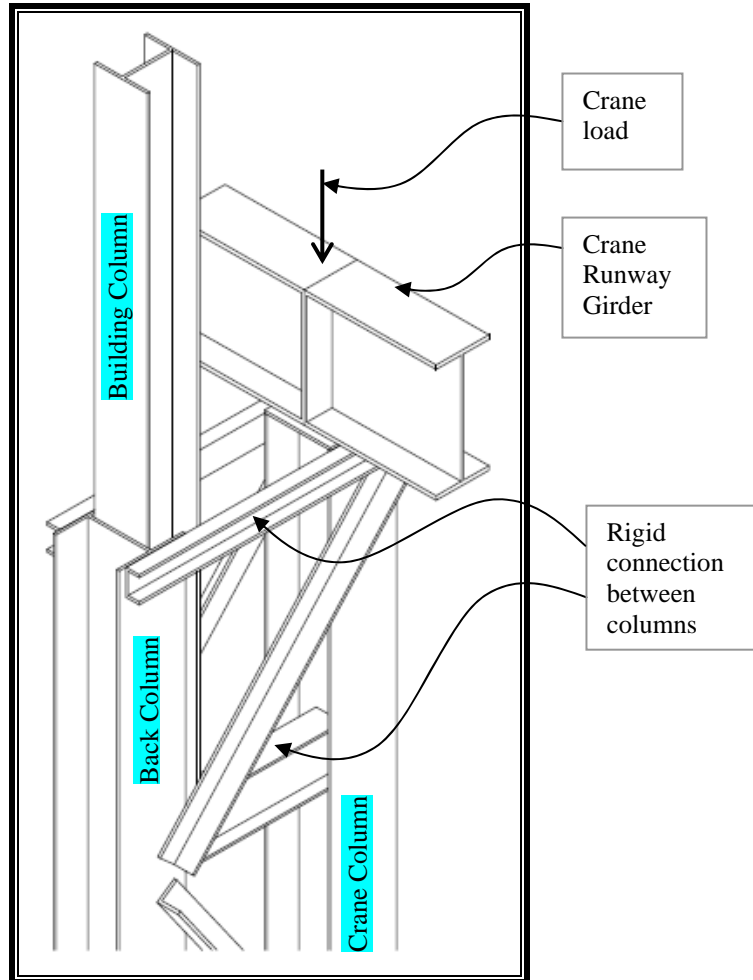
The top portion of the column setup (top left view). Assume a rigid connection between the back column and crane column
